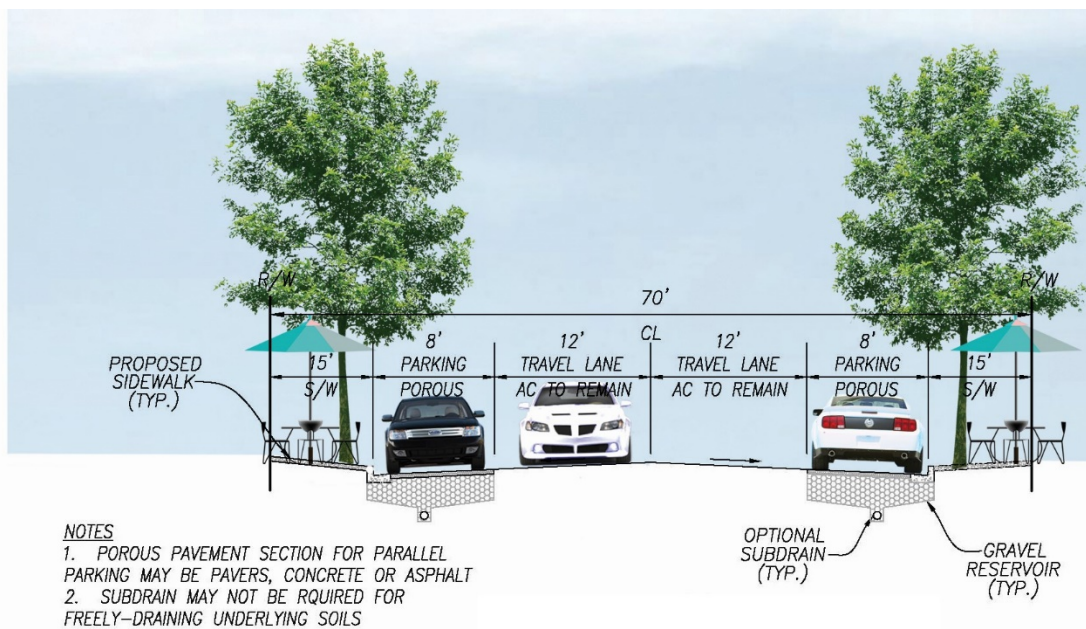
Main Street Cross-Section – Sulphur Street to Lakeshore Drive
